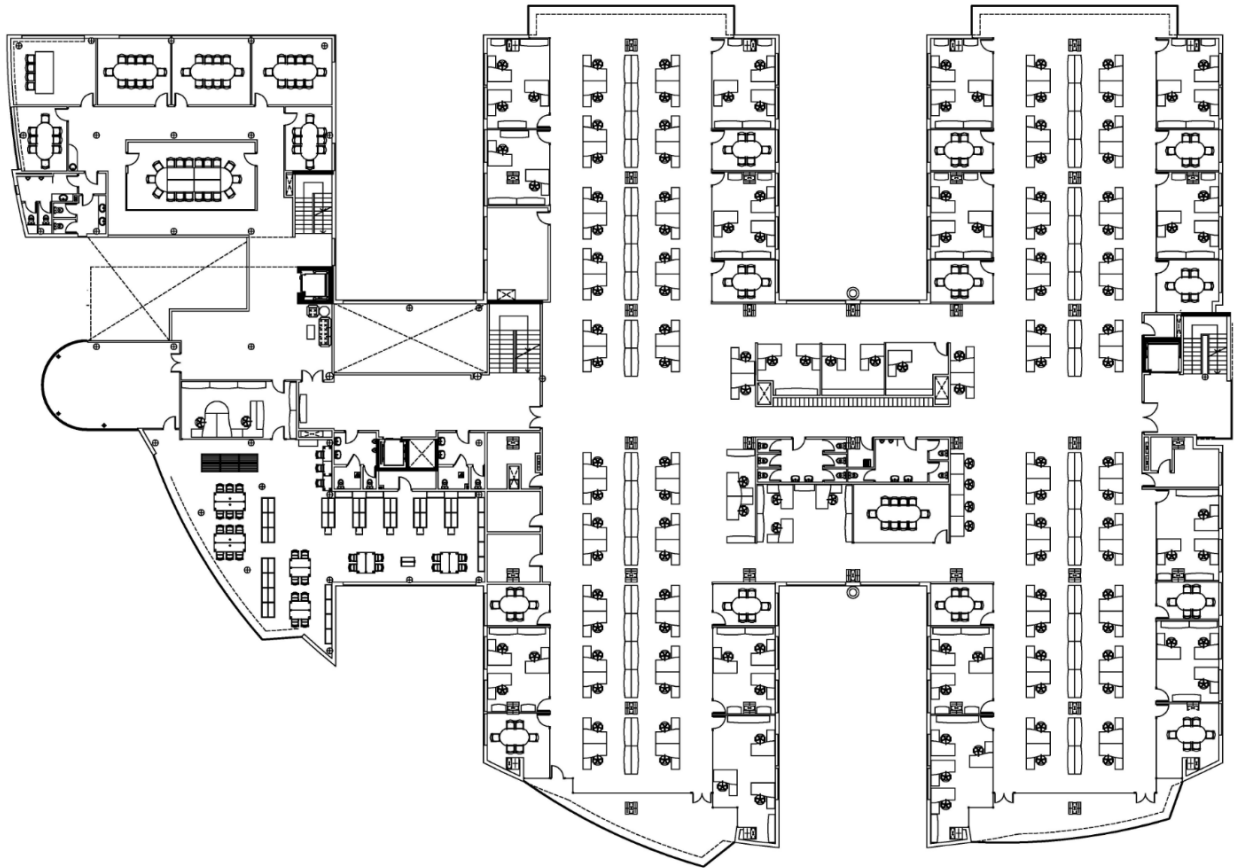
Plans of TECNALIA pilot site (1st floor)
